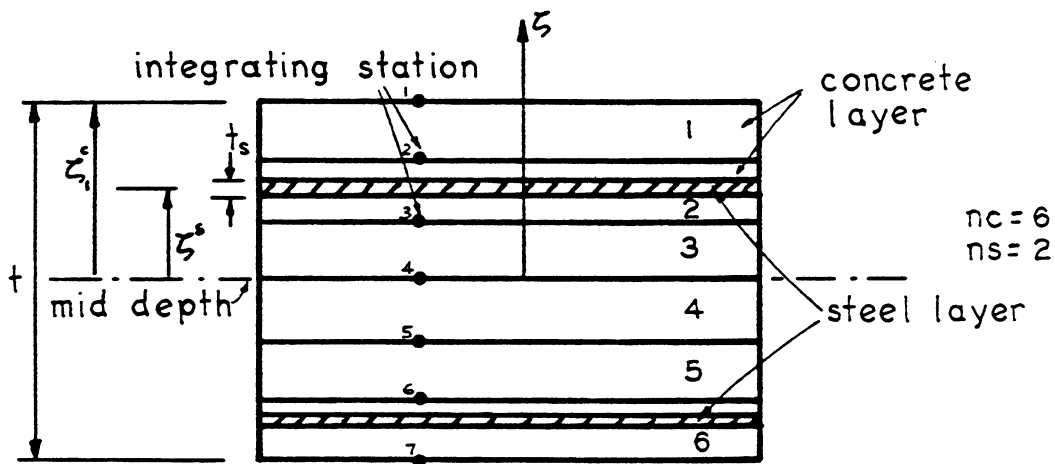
TYPICAL REINFORCED CONCRETE LAYER SYSTEM
